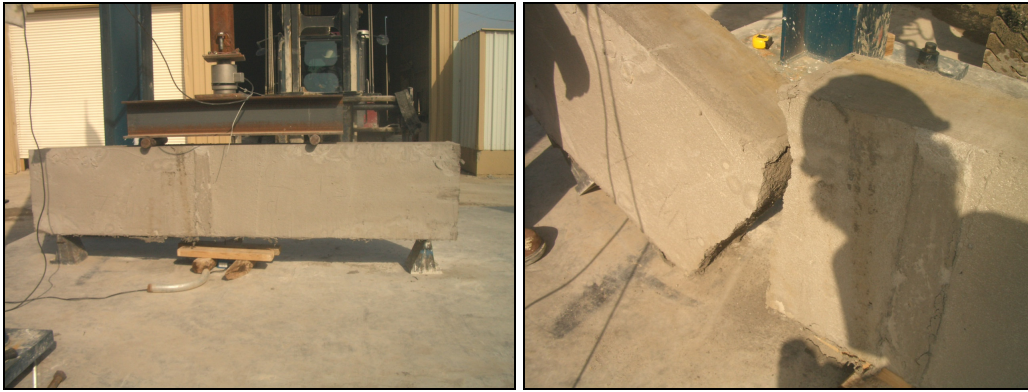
Beam for 2<sup>nd</sup> batch concrete cast on 11/2/06 for 1 day test;
